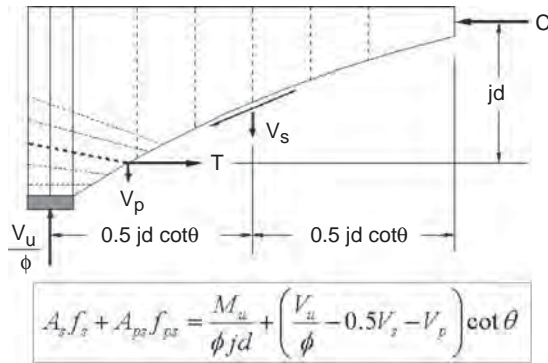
Shear demands on longitudinal reinforcement at end of prestressed girder.
